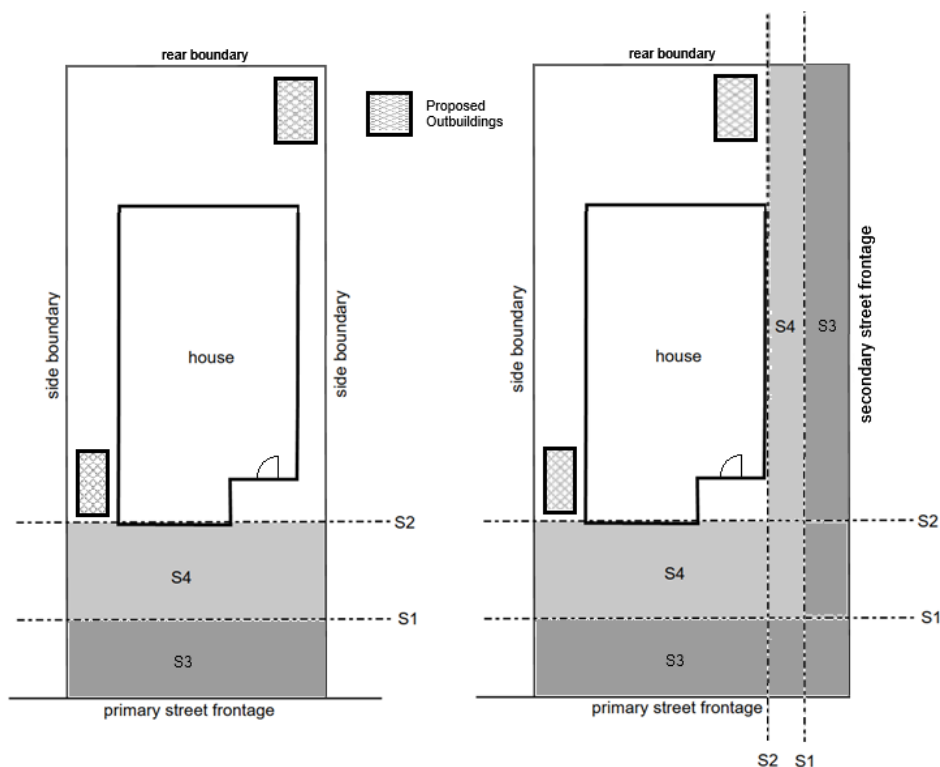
Outbuilding modifications in this local planning policy would apply to these outbuildings.
